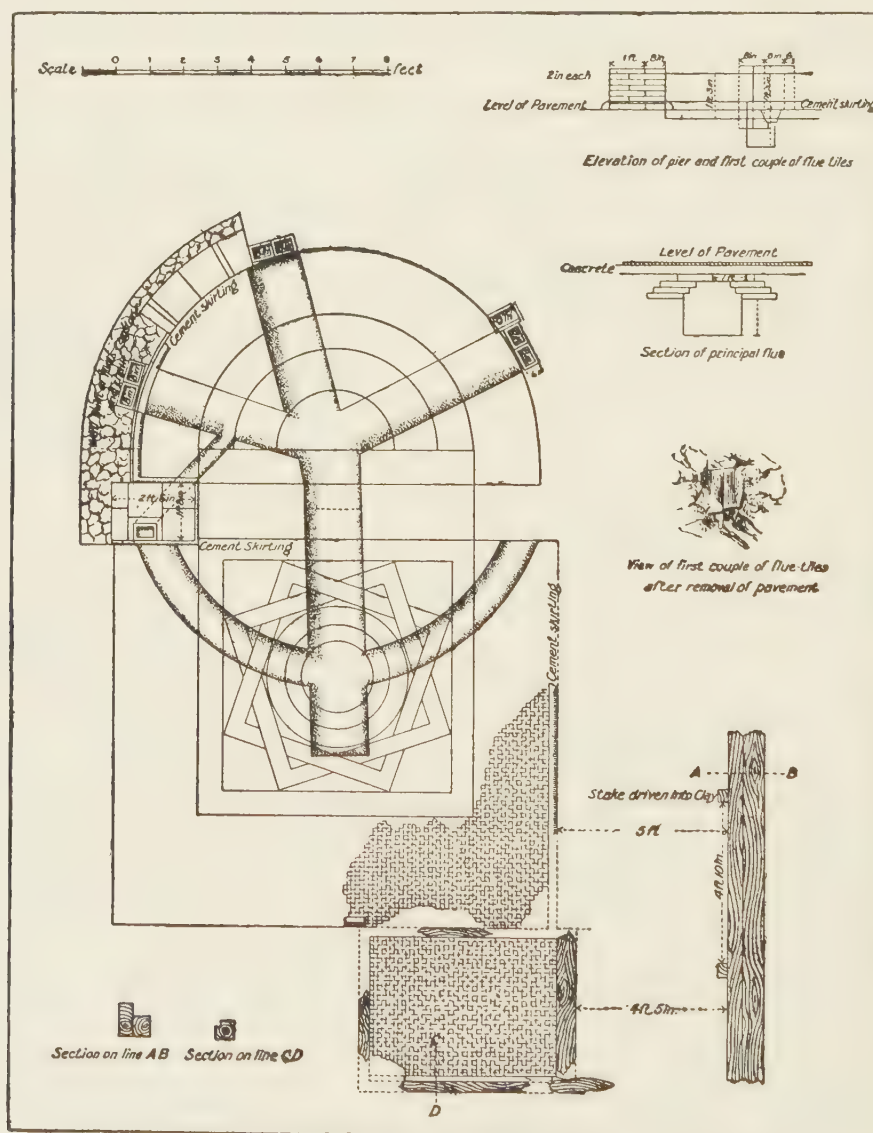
PLAN SHOWING HYPOCAUST UNDER THE BUCKLESBURY PAVEMENT
